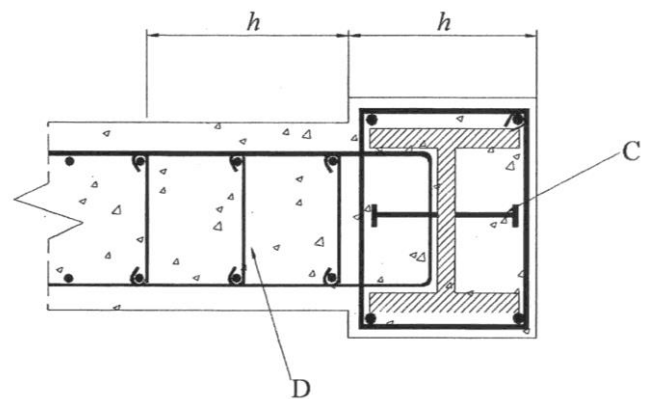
Details of partially encased composite boundary elements (details of transverse reinforcements are for ductility class DCH).
